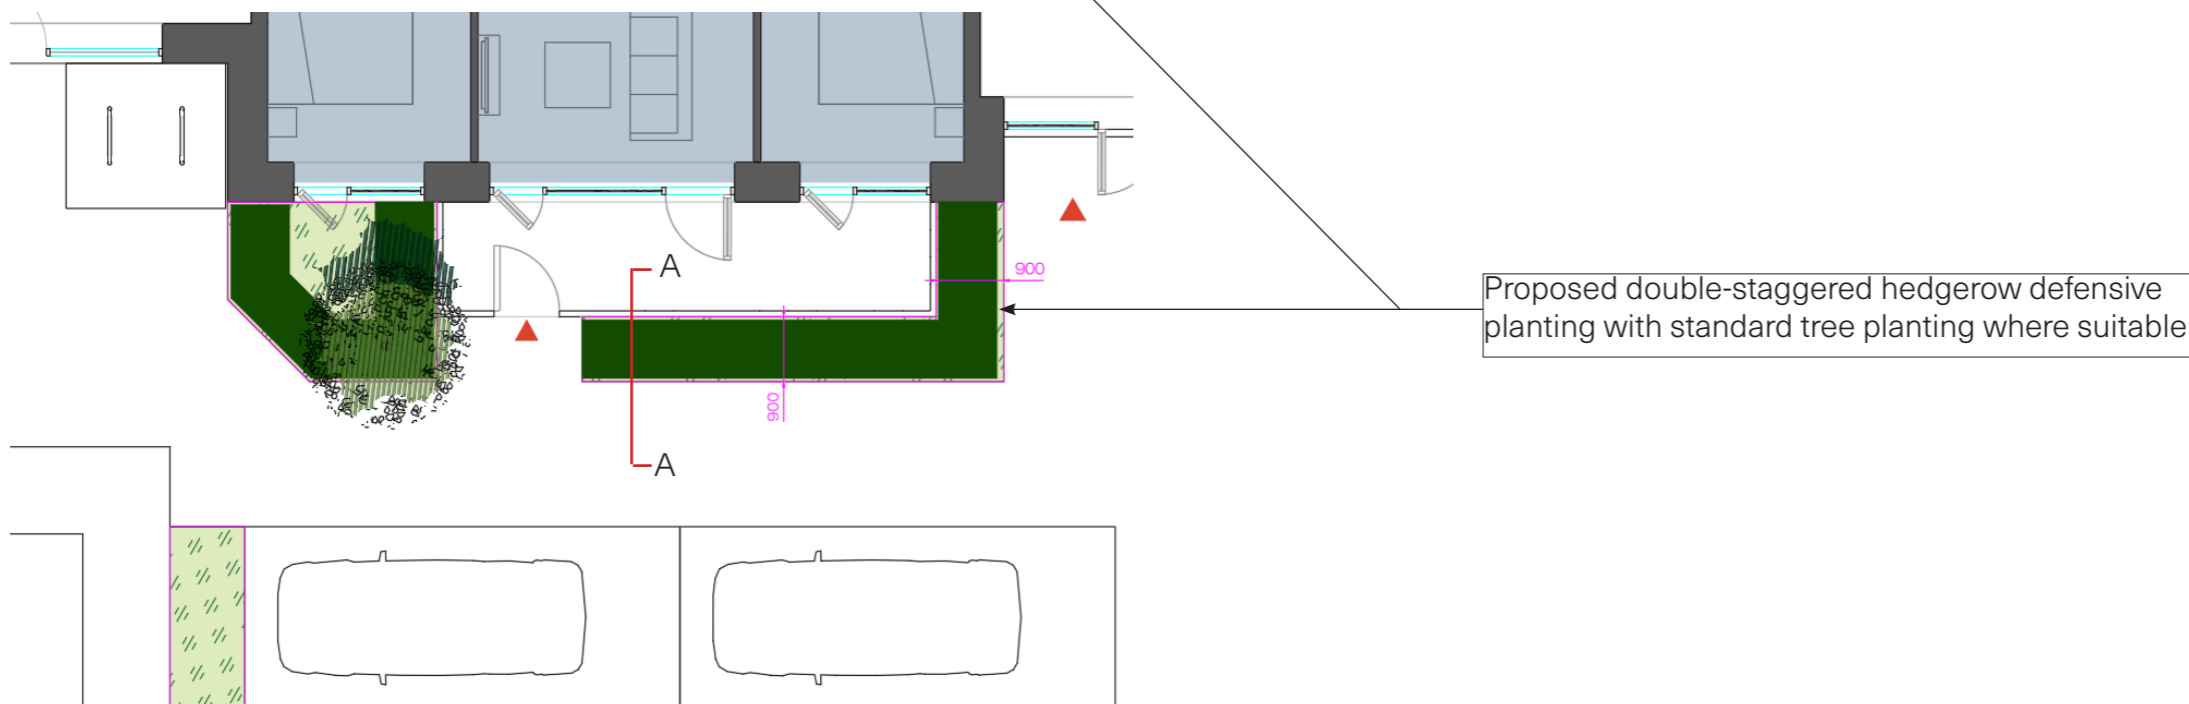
Plan showing proposed apartment entrance landscape treatment
